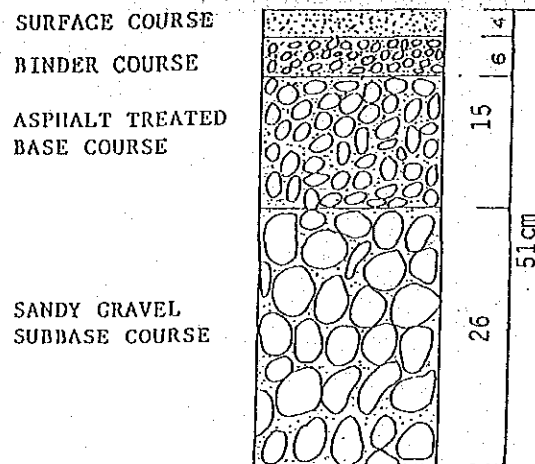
Flexible Pavement Structure for Design Road Segment of South Klang Straits Bypass-Jalan Cheras
